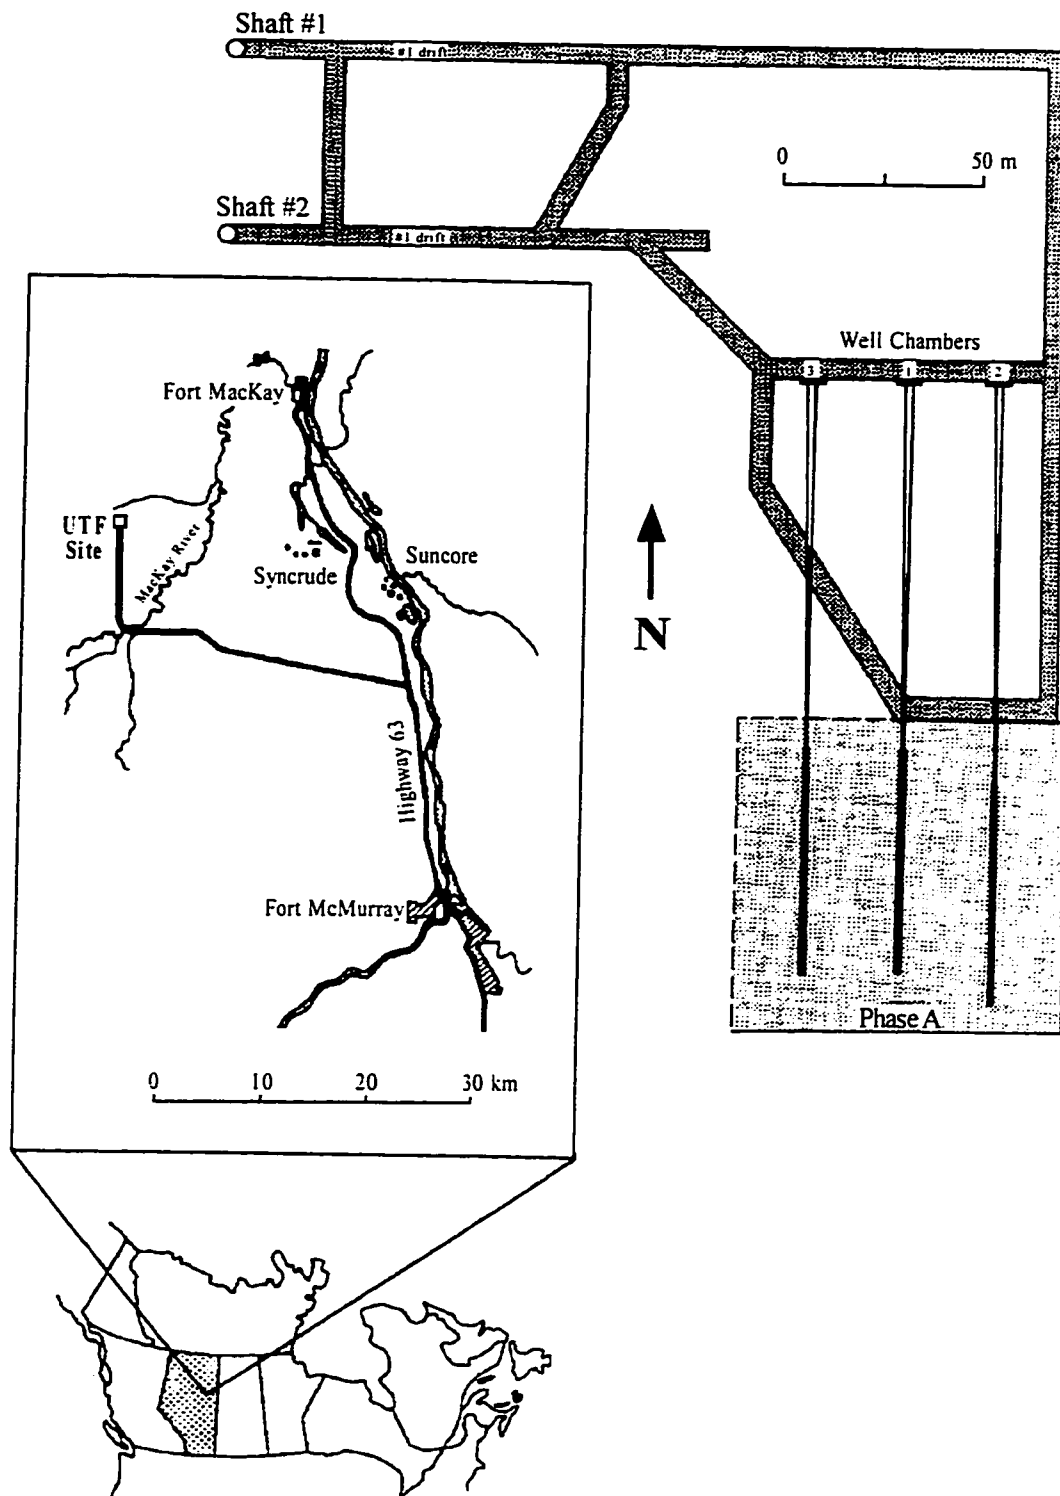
Location of the UTF site and layout of shafts, tunnels and Phase A horizontal well pairs
